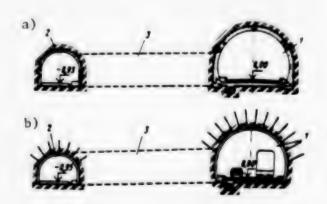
Cross-section of tunnel: a-with monolithic concrete lining; b-with combined lining of reinforced concrete roof bolting and sprayed concrete; l-highway tunnel; 2-drainage and ventilation adit; 3-connector.
